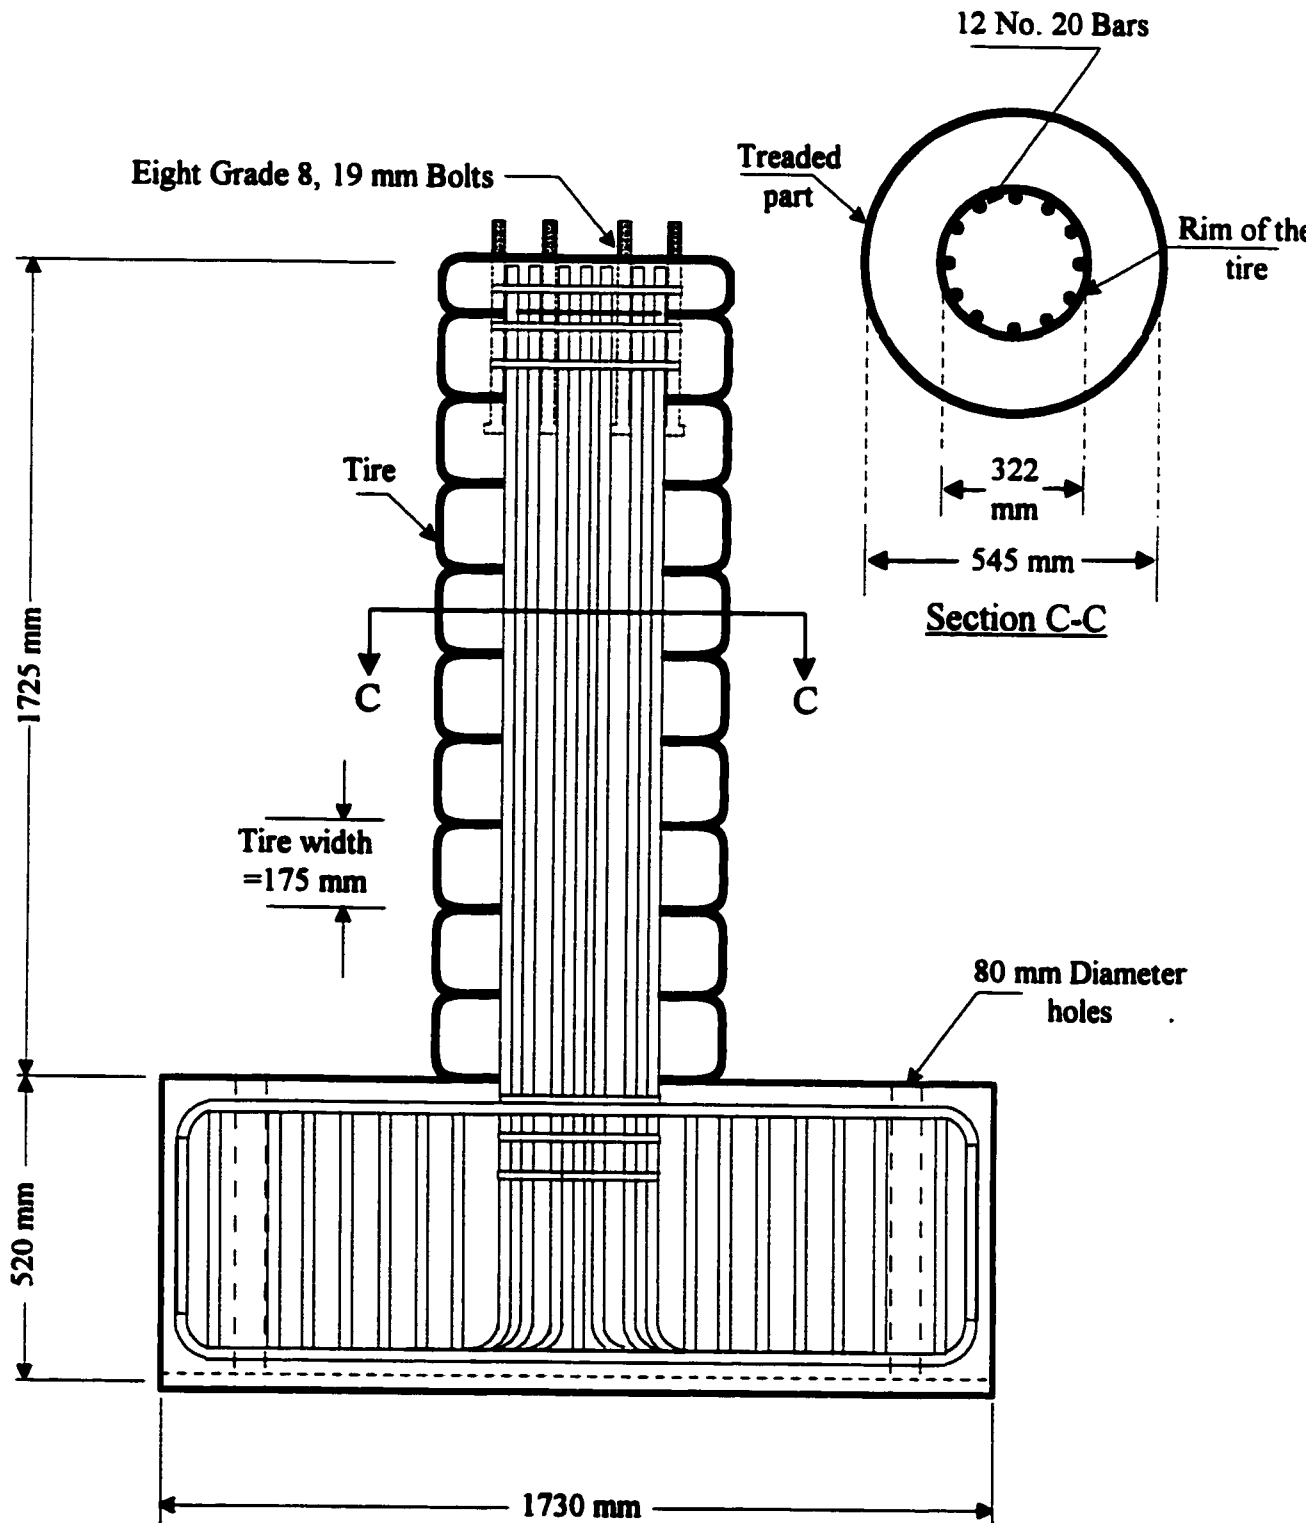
Reinforcement Details for Columns TC-5 and TC-6
